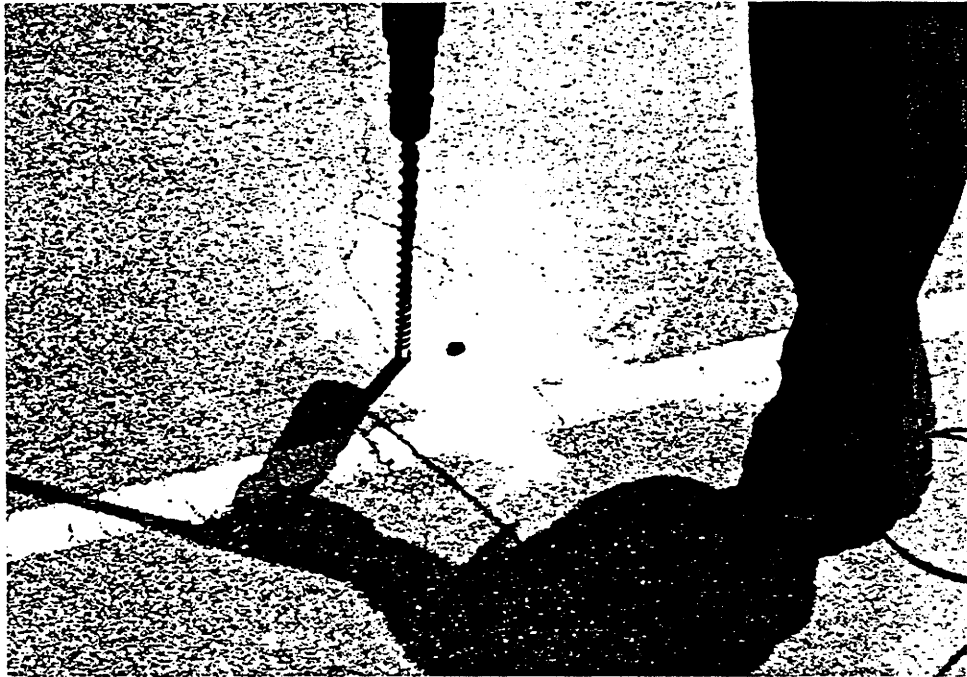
Transverse Crack Pattern in the Pavement (Note: Y Shaped Crack Near Shoulder Paint Stripe).
